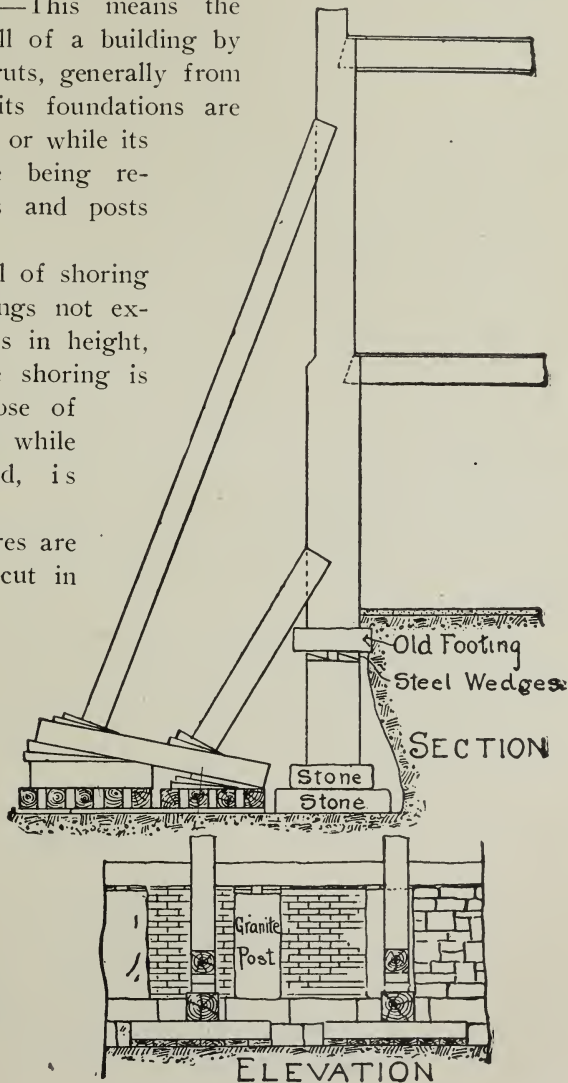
Shoring or Inclined Bracing and Underpinning.
